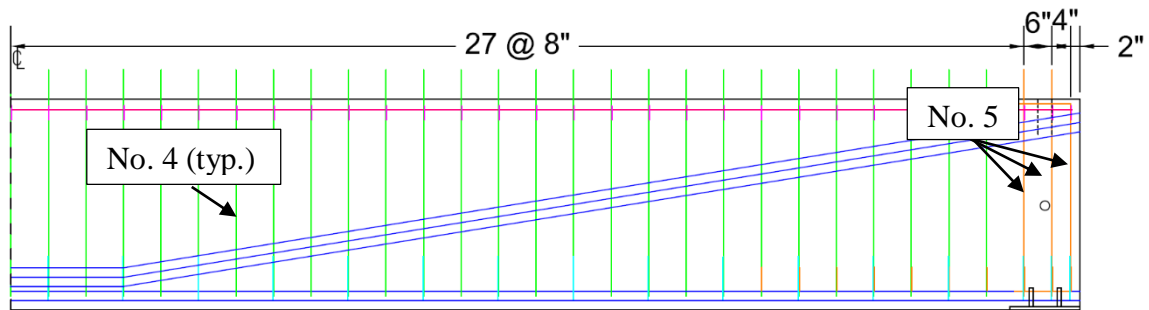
Transverse reinforcement layout for the 45M_8W girder end.
